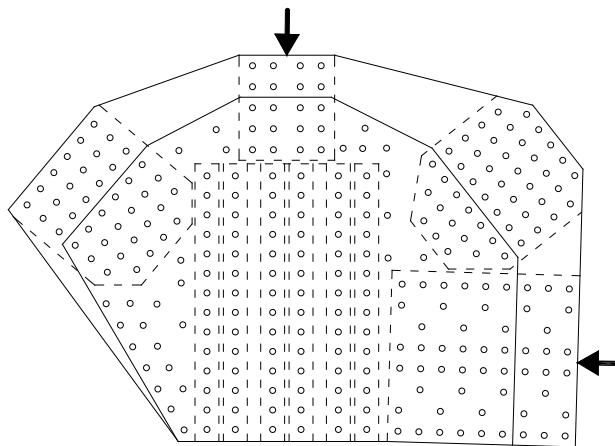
Example Showing Truss Vertical and Chord Members in Compression that Do Not Require a Partial Shear Plane Check
